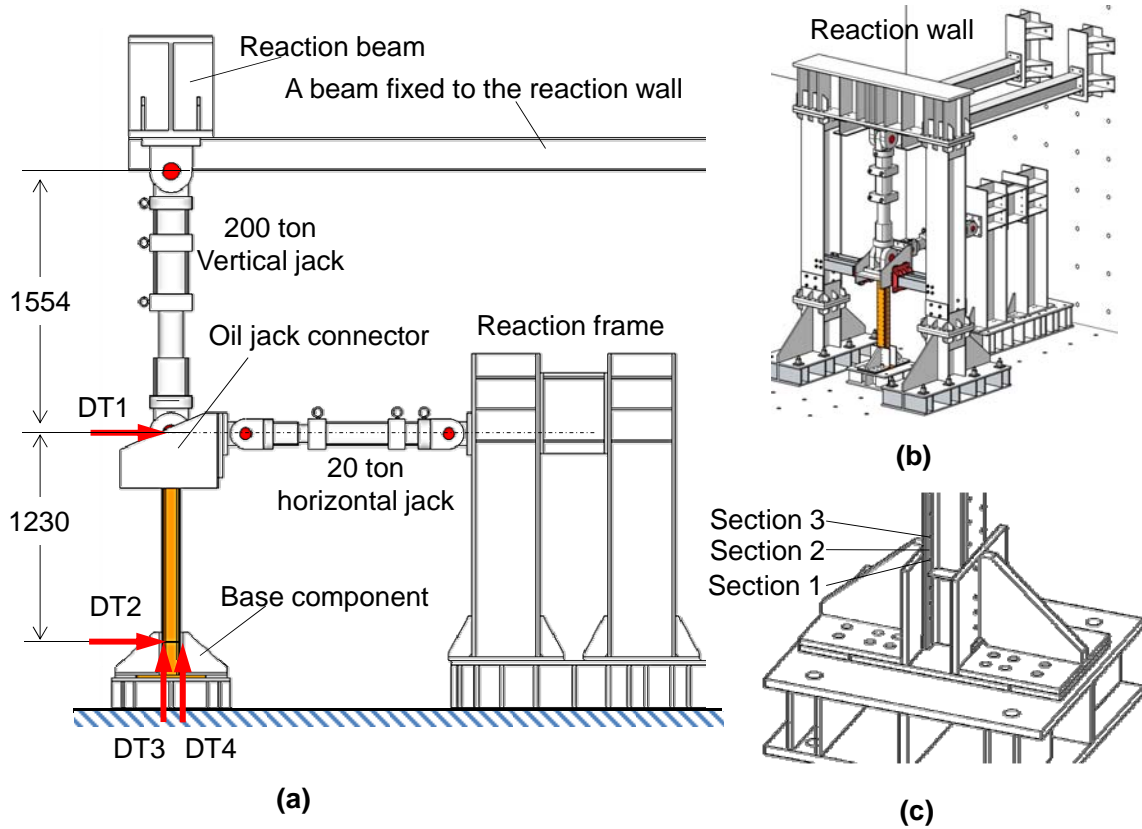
Setup: (a) elevation view; (b) 3-D view; (c) connection details (unit: mm).
